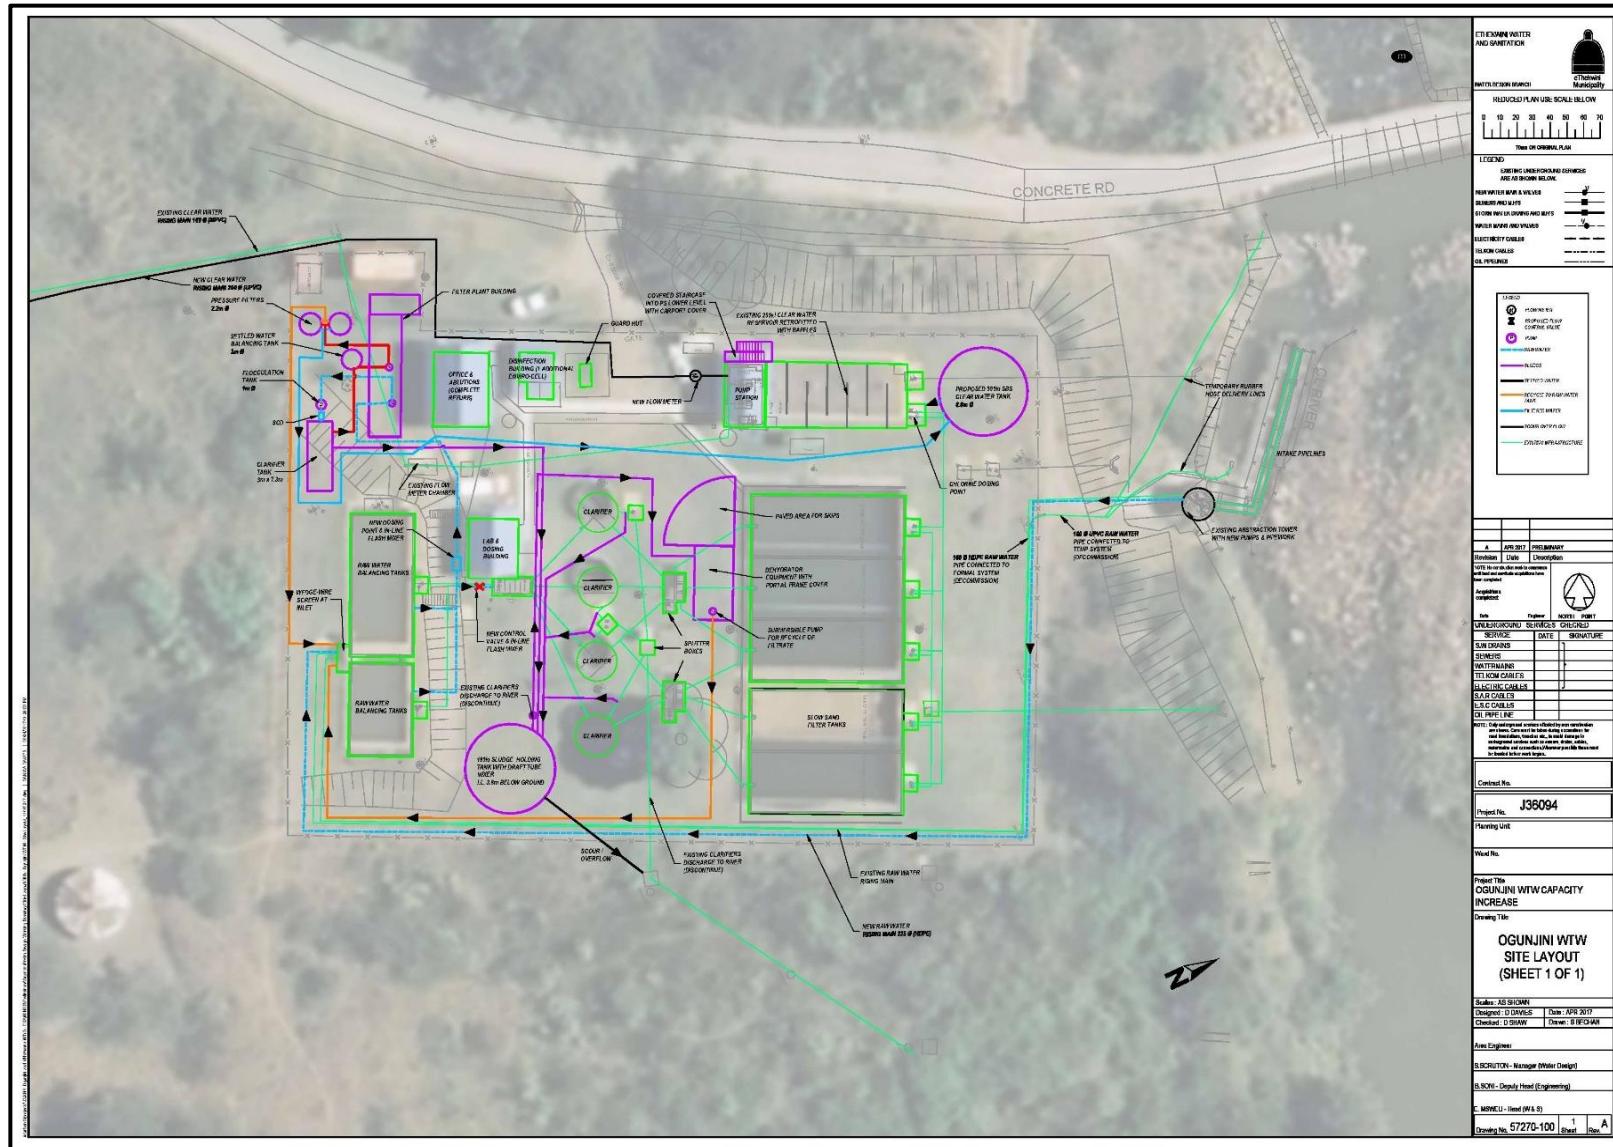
Aerial image depicting layout of the proposed Ogunjini water treatment works (Source: Gibb (Pty) Ltd, 2017).
